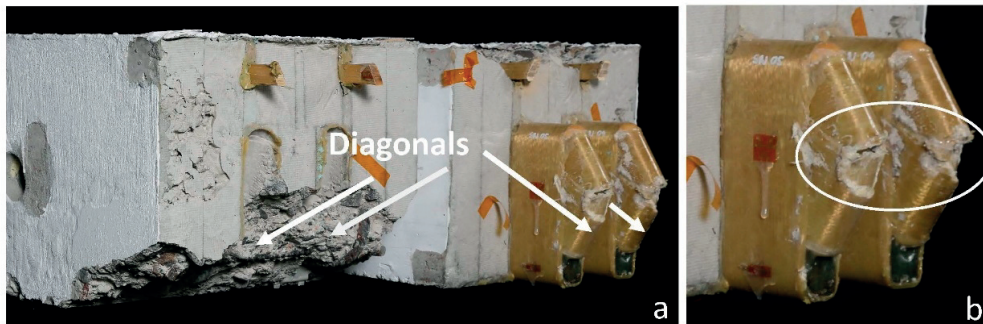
Failure mode of beam A200: a) bottom concrete spalling in interior (left) beam, b) wrinkling/crushing of AFRP hexagon diagonal.
